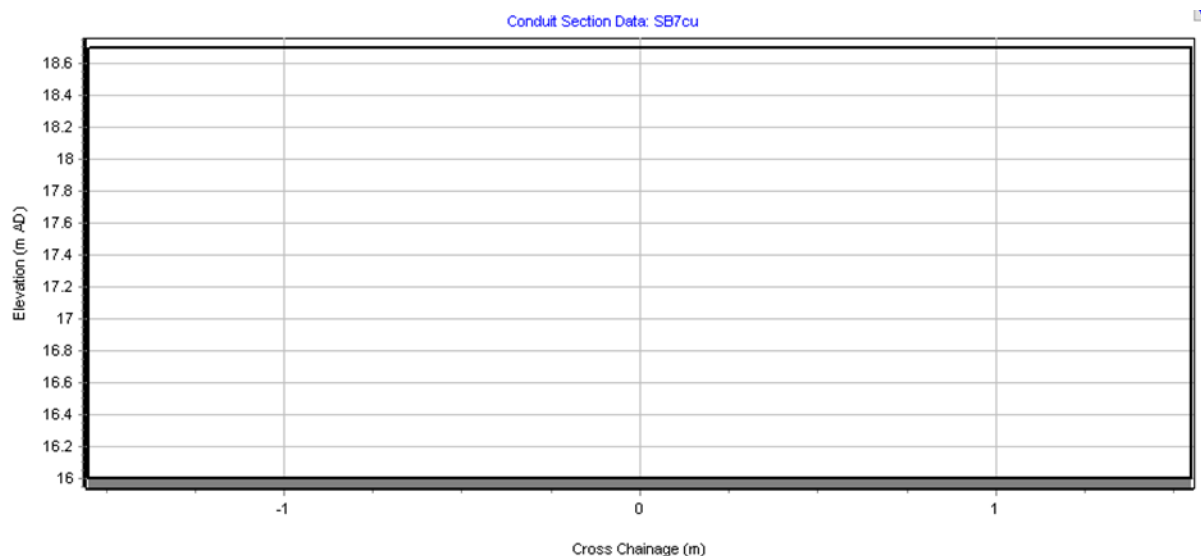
South Brook Modelled Proposed A428 Culvert (dimensions not to scale)
